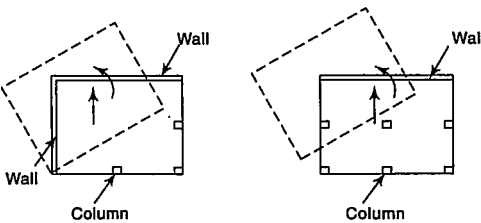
Twisting due to walls on two/one sides (in plan) (Murthy 2005)
